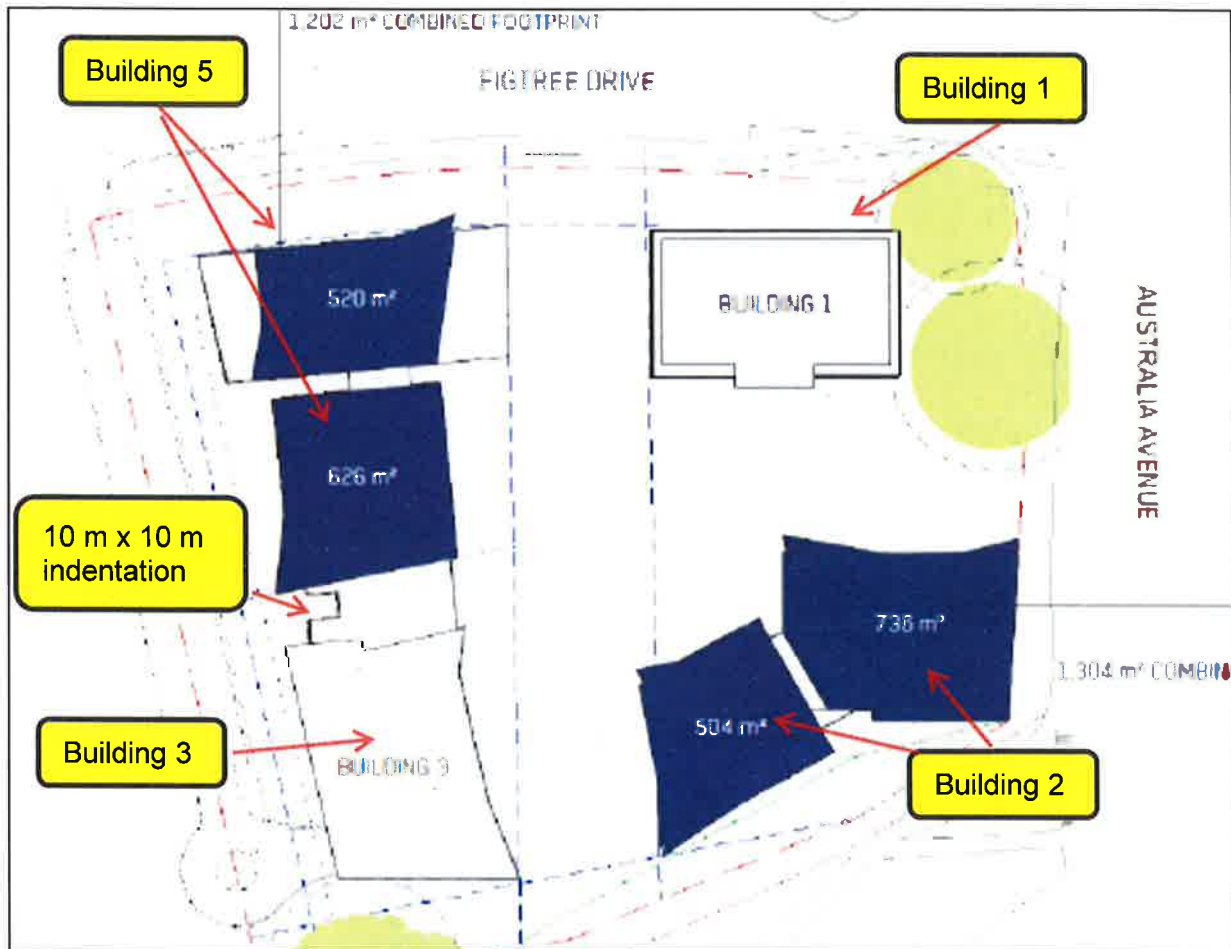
Floorplates for Buildings 2 and 5 (Source: RtS)
